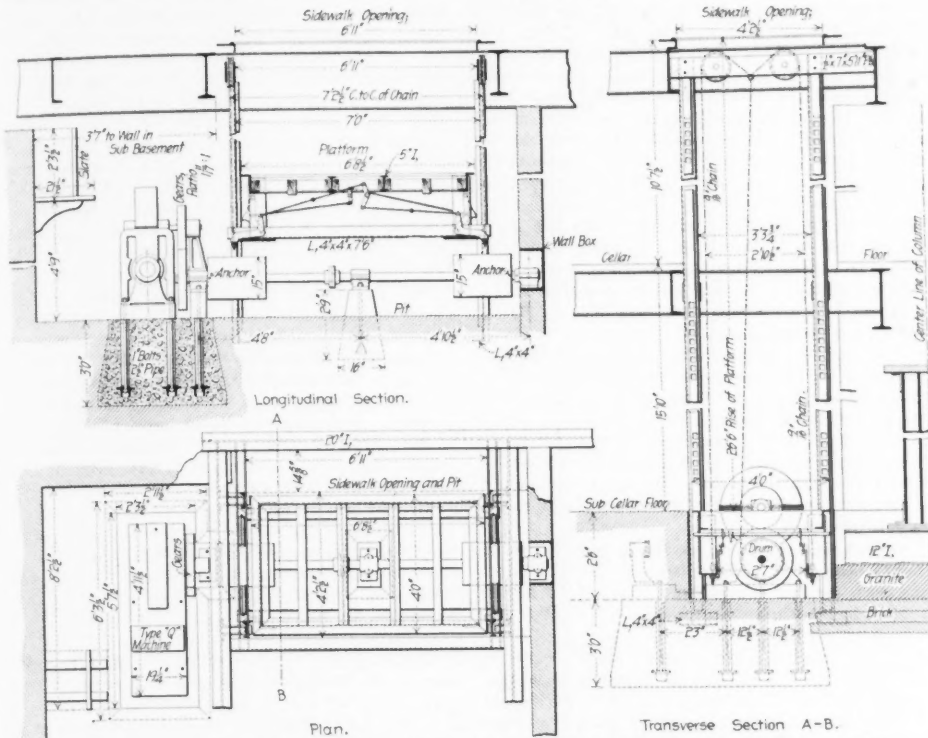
PLAN AND ELEVATIONS OF THE ELECTRIC SIDEWALK HOISTS, IVINS' SYNDICATE BUILDING, NEW YORK CITY. Sprague Electric Co., New York City, Builders.
